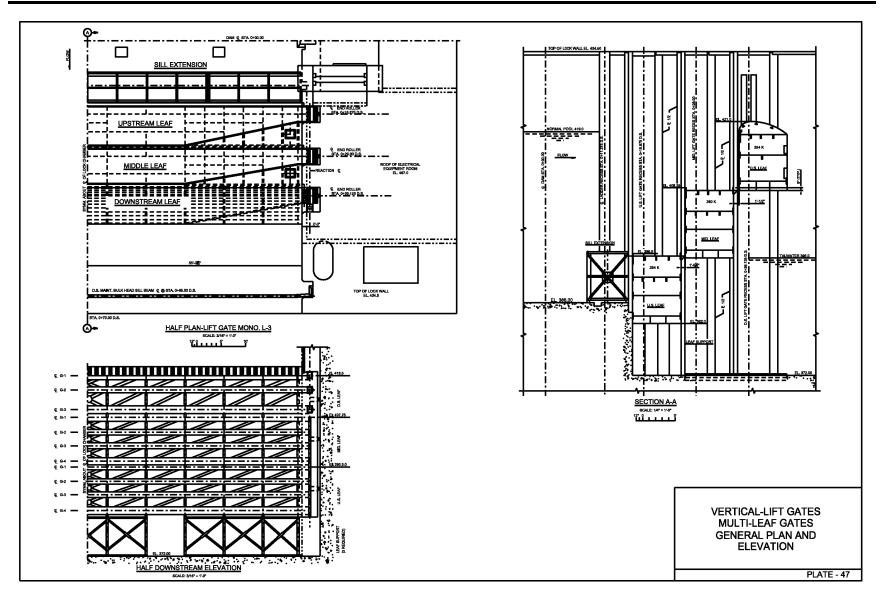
Plate 47: Vertical-lift gates, multi-leaf gates, general plan, and elevation
